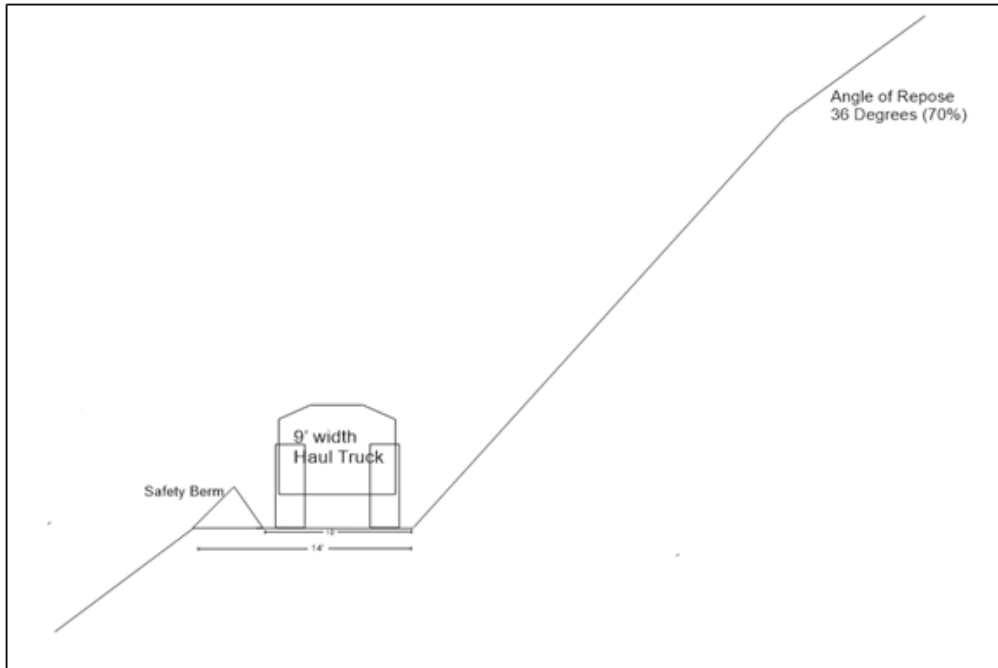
Stibium Pioneered Access Trail Cross-Section
